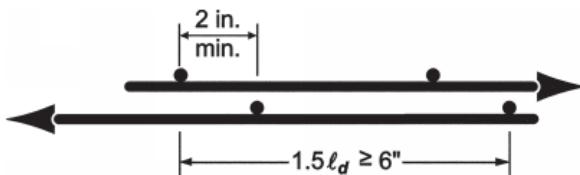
Lap Splices of Plain Welded Wire Reinforcement where $(\text{Provided } A_s)/(\text{Required } A_s) < 2$ (adapted from ACI 318-14, Courtesy of ACI)
